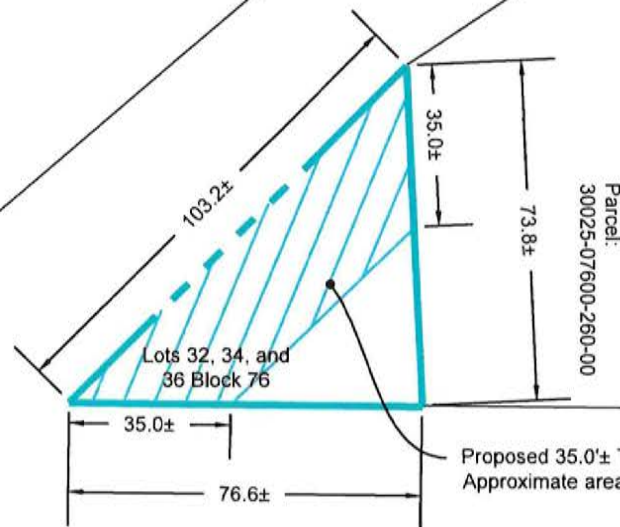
EXHIBIT 'A'TEMPORARY CONSTRUCTION EASEMENT
